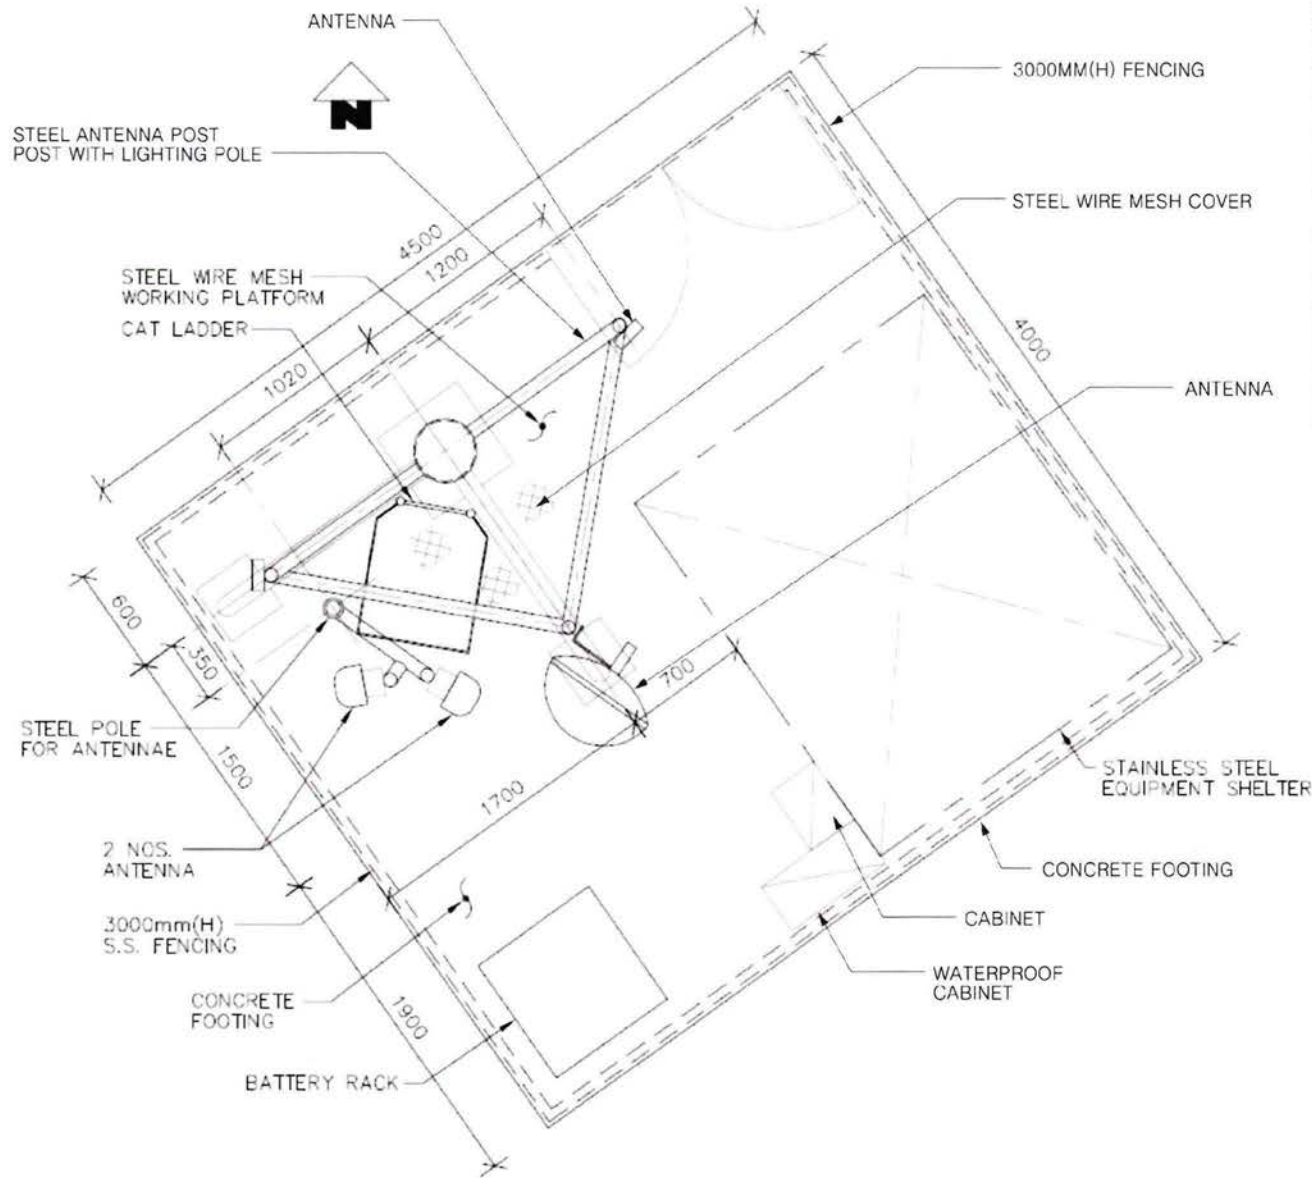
Layout Plan [Modified from the Project Profile (Register No. PP-423/2010)]
